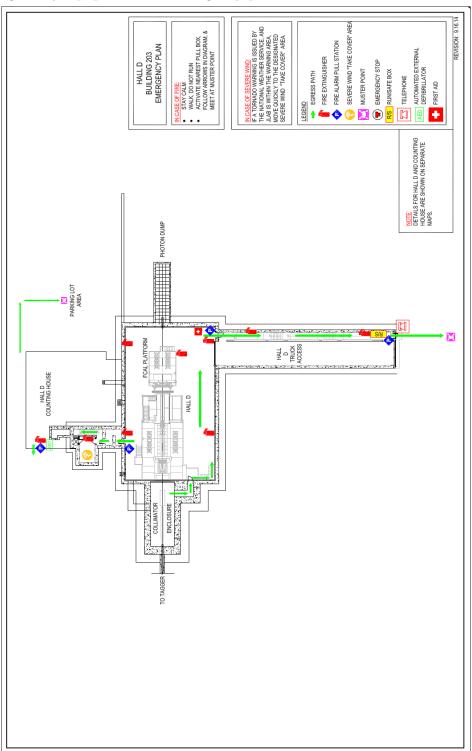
Layout of the Hall D counting house indicating safety equipment and emergency plan.
